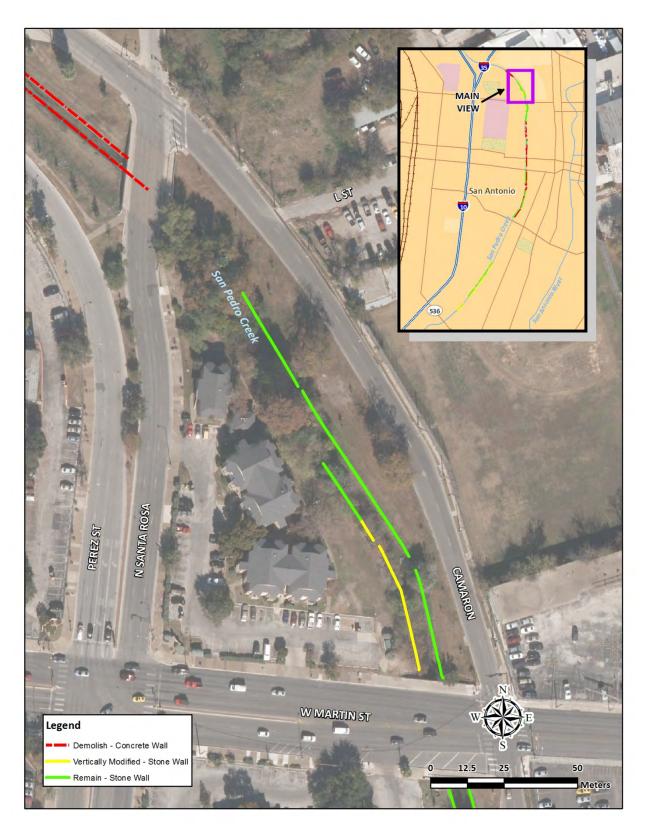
Proposed impacts to the west and east bank retaining walls between Santa Rosa and Martin Street.
